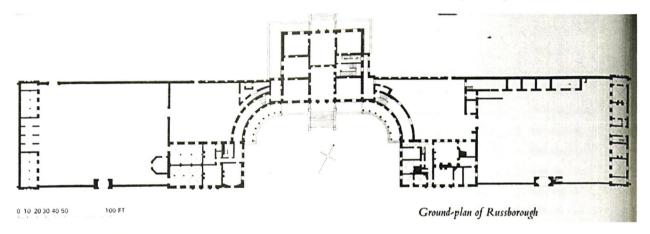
plan of the ground floor, incl. central blocks, colonnades, wings and their private gardens, and the service buildings with the associated yards by John Steward, 1967 curtesy of Irish Houses and Castles (London 1971)
